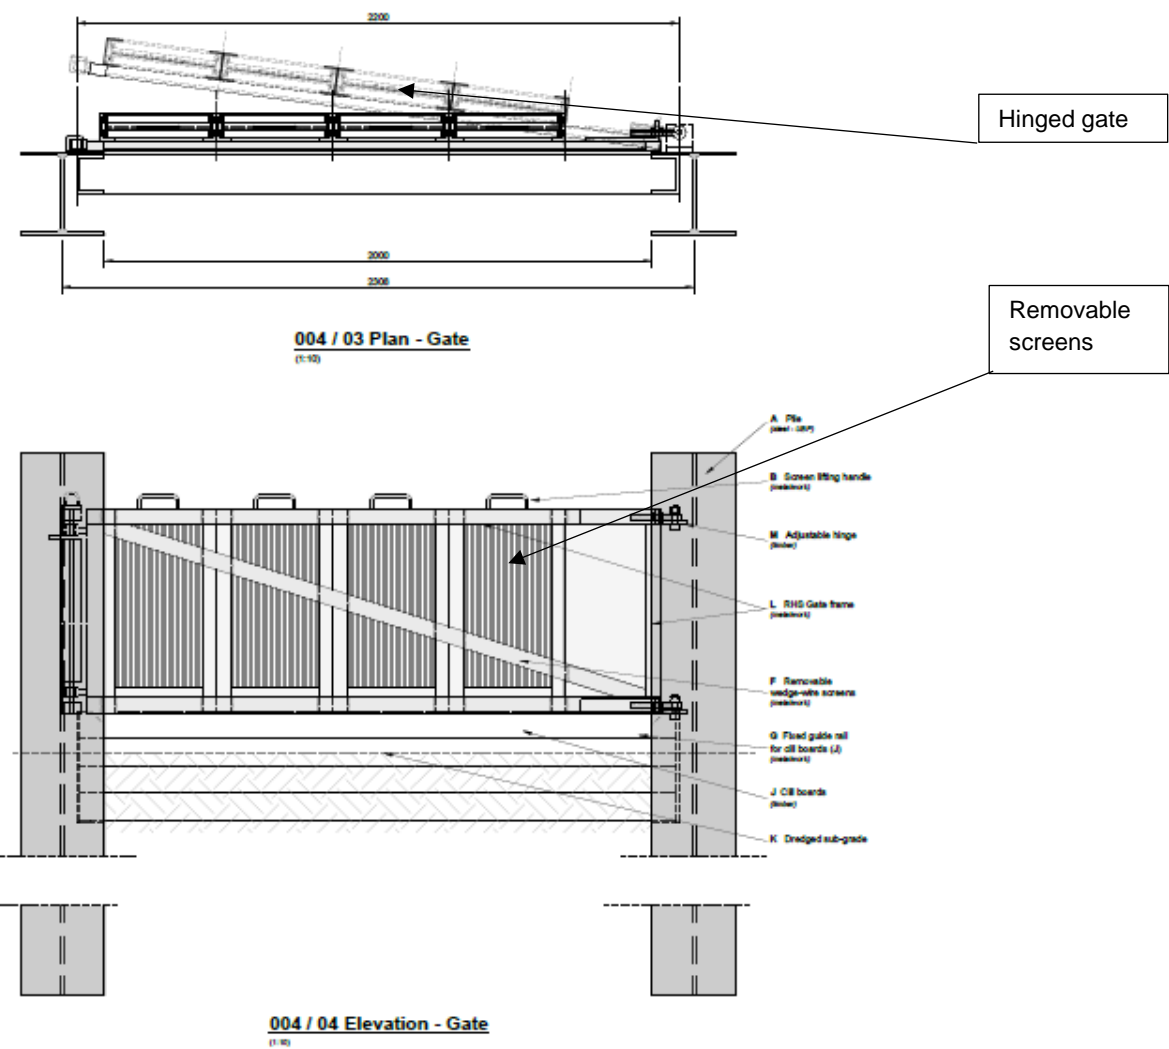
Design of Barrier – Assembled Gate – In Plan & Elevation – Extract From Drawing 004
